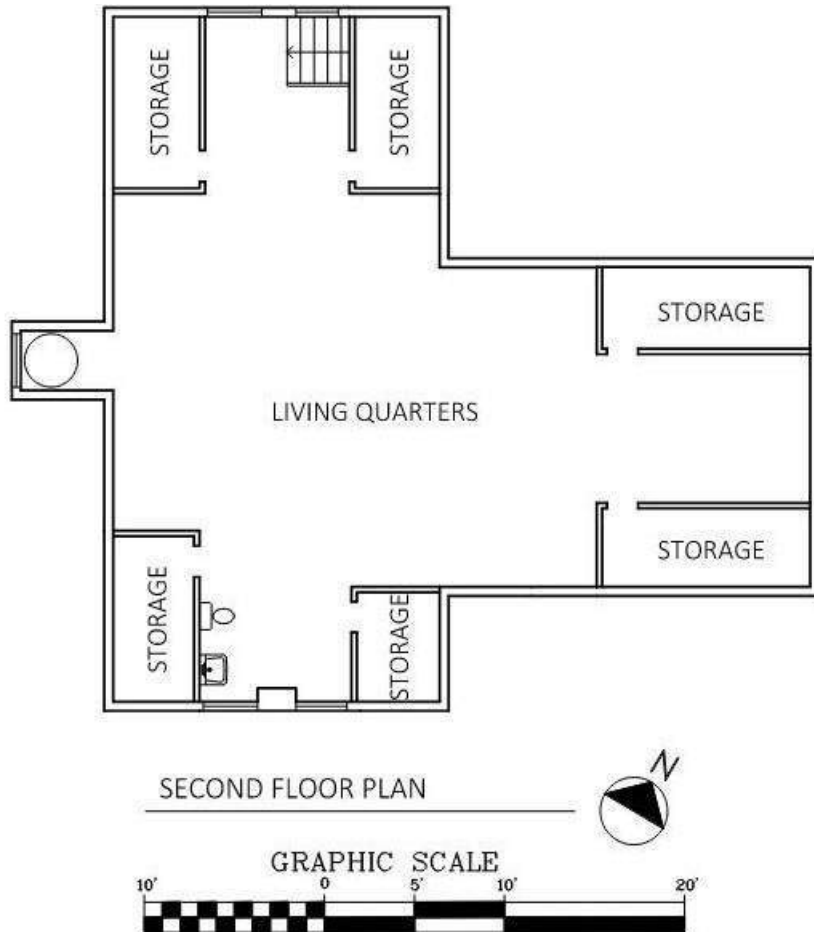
Sketch Plan of Second Floor of Maintenance Garage.
